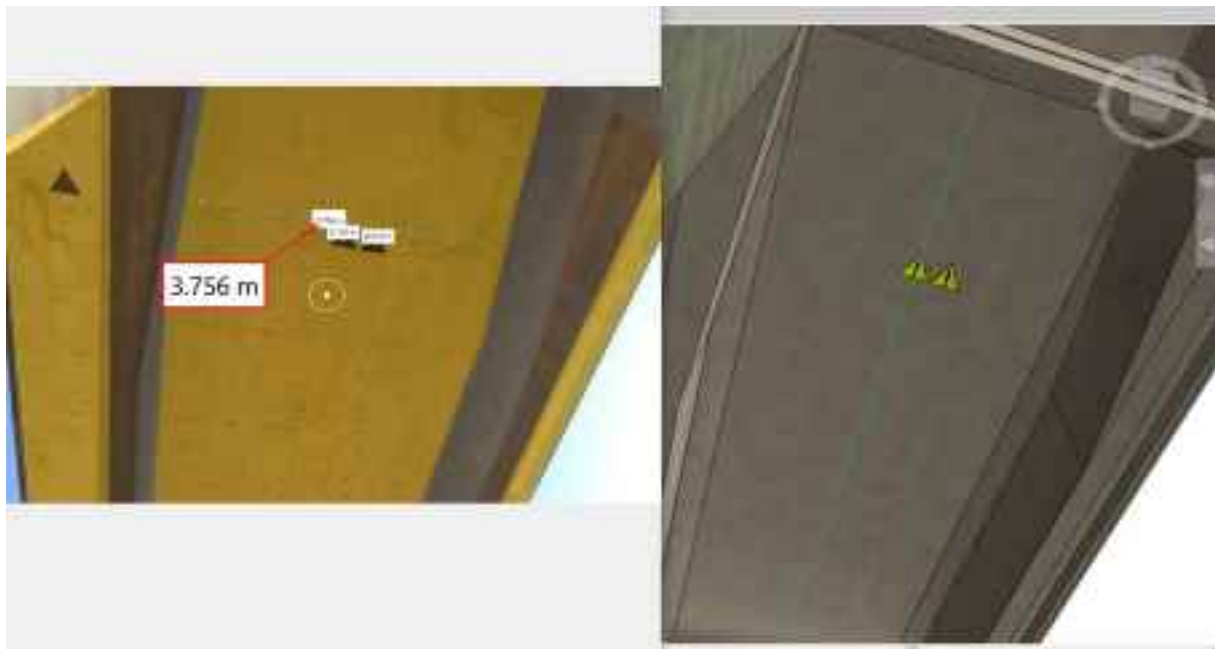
Efflorescence and crack measurements at the bridge slab.
